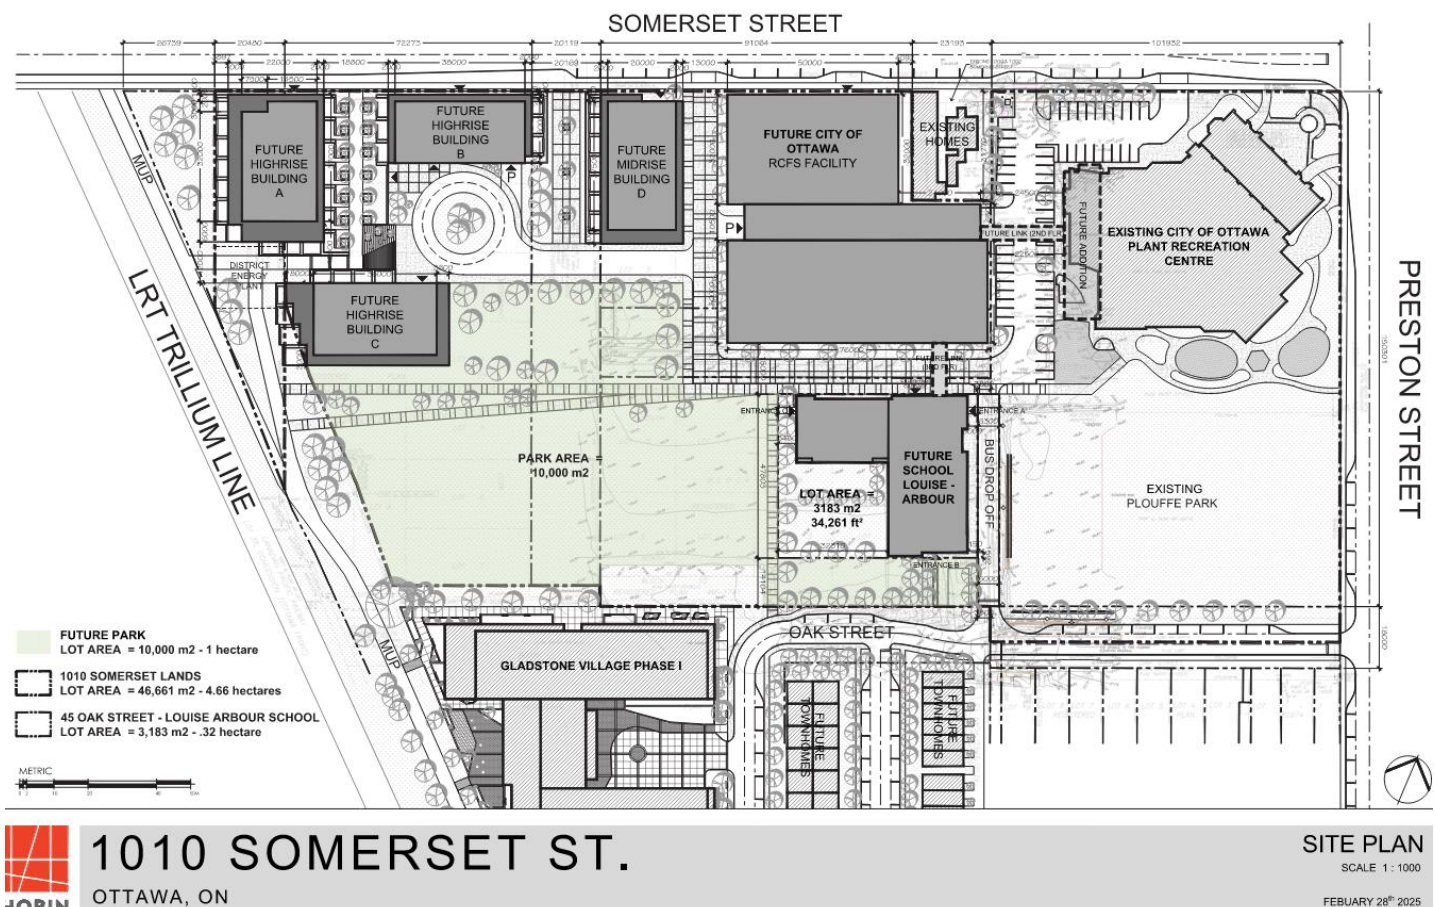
Concept Plan prepared by Hobin Architecture. Minor refinements have been made to the Concept Plan since the December 2024 version as design of the school has advanced.
